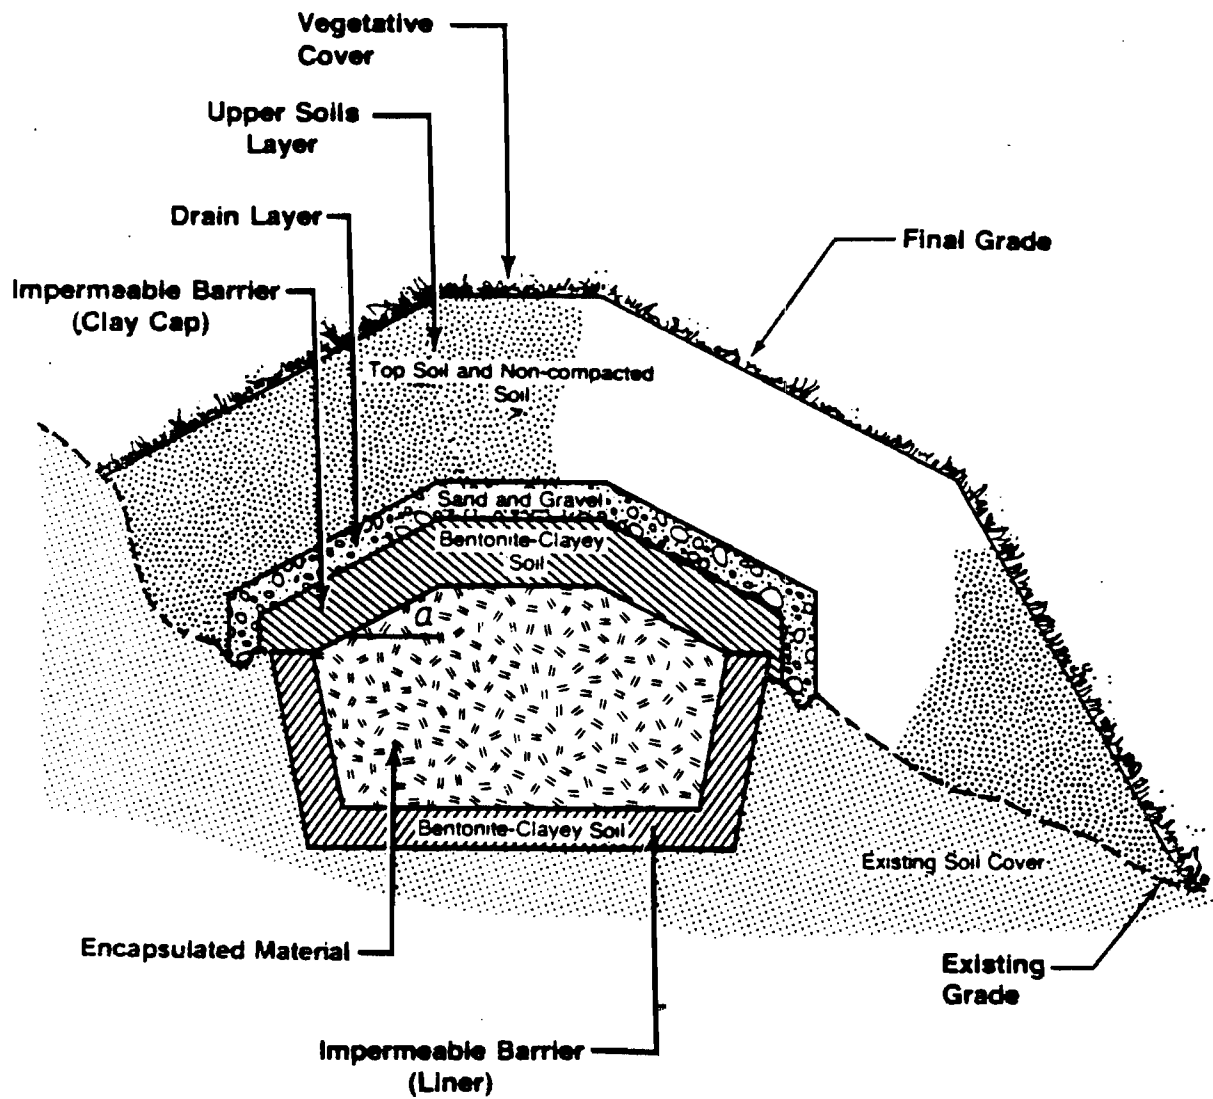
Profile of encapsulation and cover - Canonsburg site (Ref. 4)
